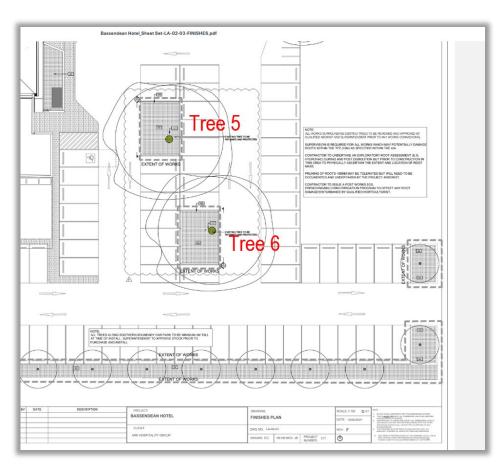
Excerpt from Finishes Plan LA-02-03 – tree numbers added by author. (16 June 2021).
